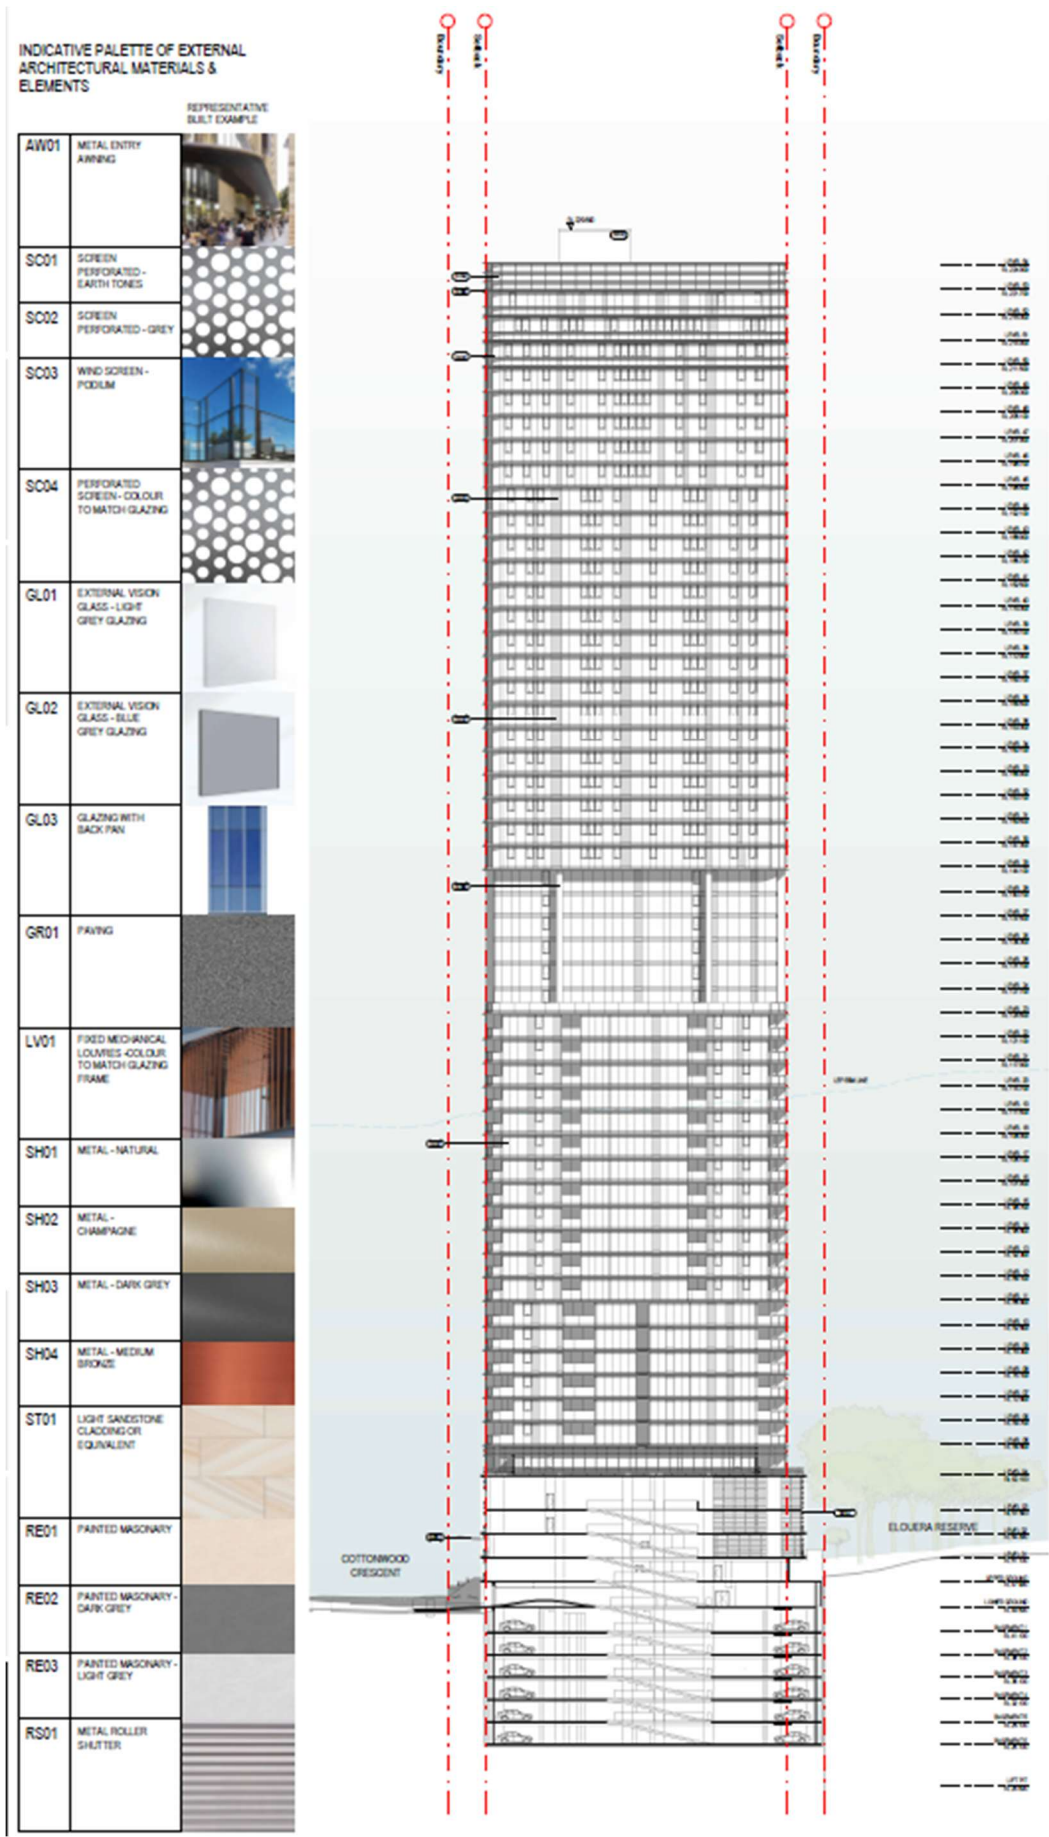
Extract of proposed plans: South Elevation (DA3103)
